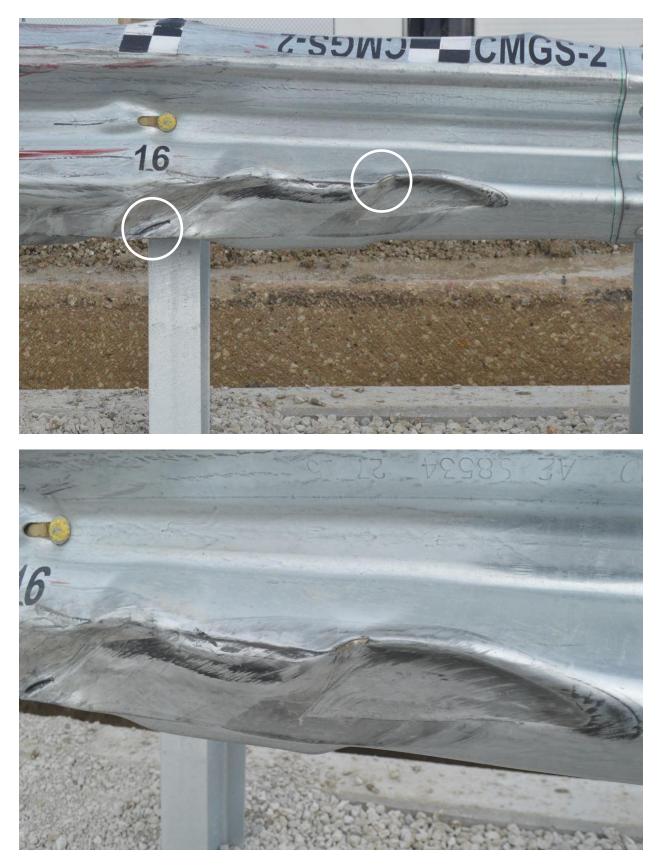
Rail Tears at Post No. 16, Test No. CMGS-2
